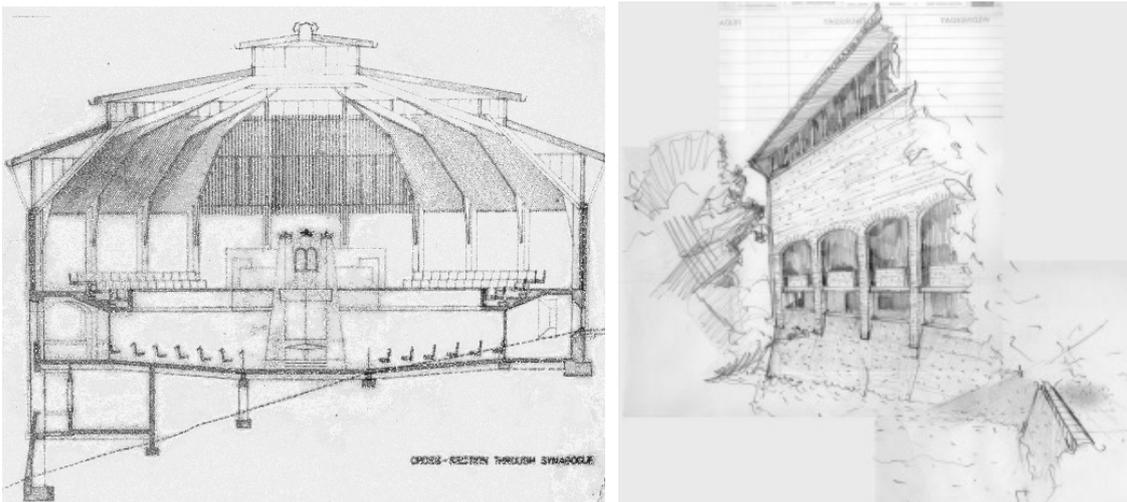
& 22: Original cross section showing proposed slatted timber screens over clerestory windows, note that the slatted screens were never added (left) Design sketch of western ambulatory looking from Myers Park, and internal view as built (right) Drawings by John Goldwater. Image source: Justine Goode
